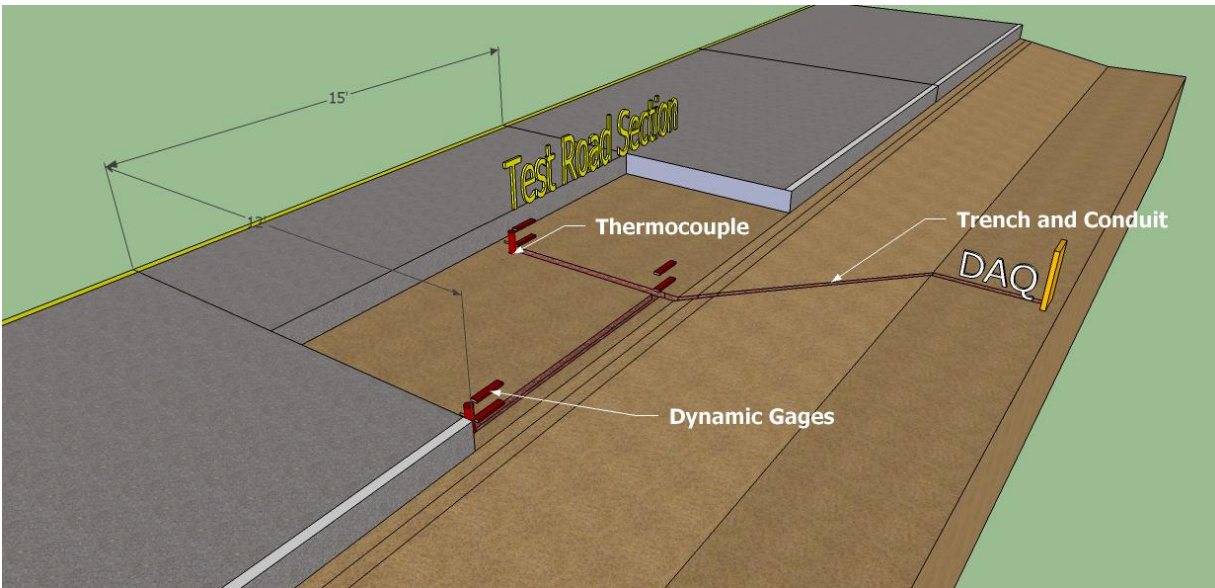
Schematics of trench and conduit to protect lead wires.
